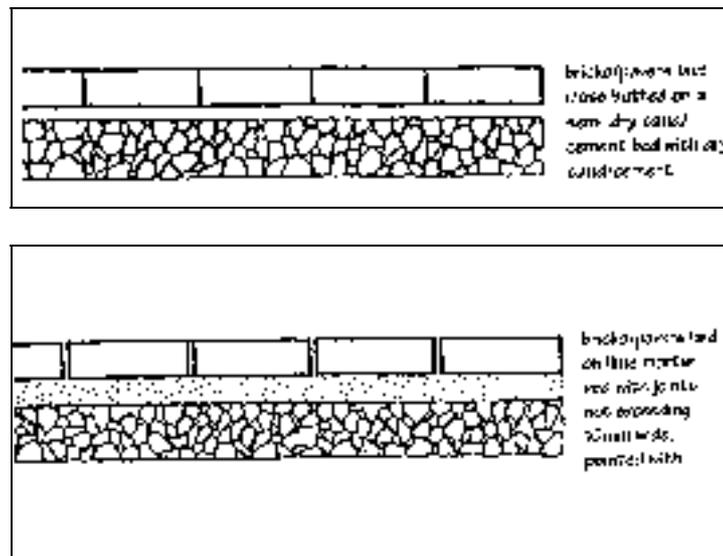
Sketch cross sections illustrating different laying and jointing methods for brick paving.
